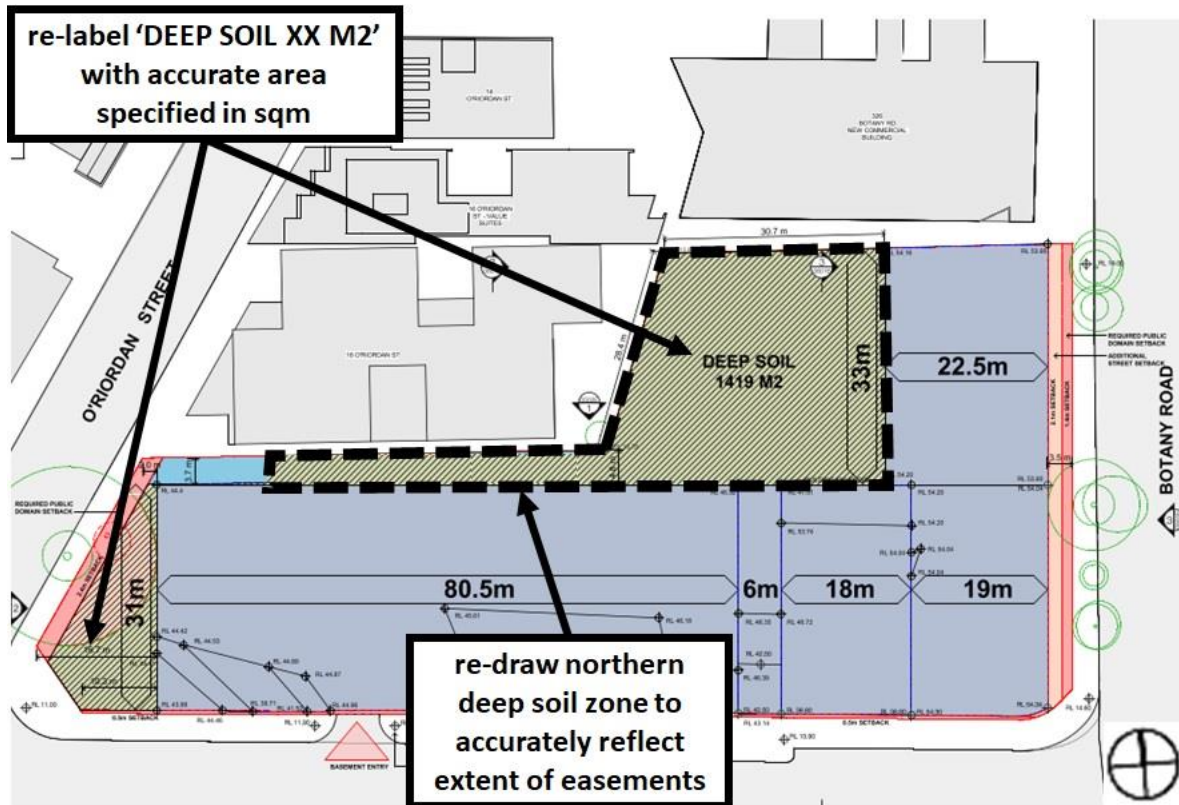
Recommended design modifications to accurately illustrate deep soil zones.
